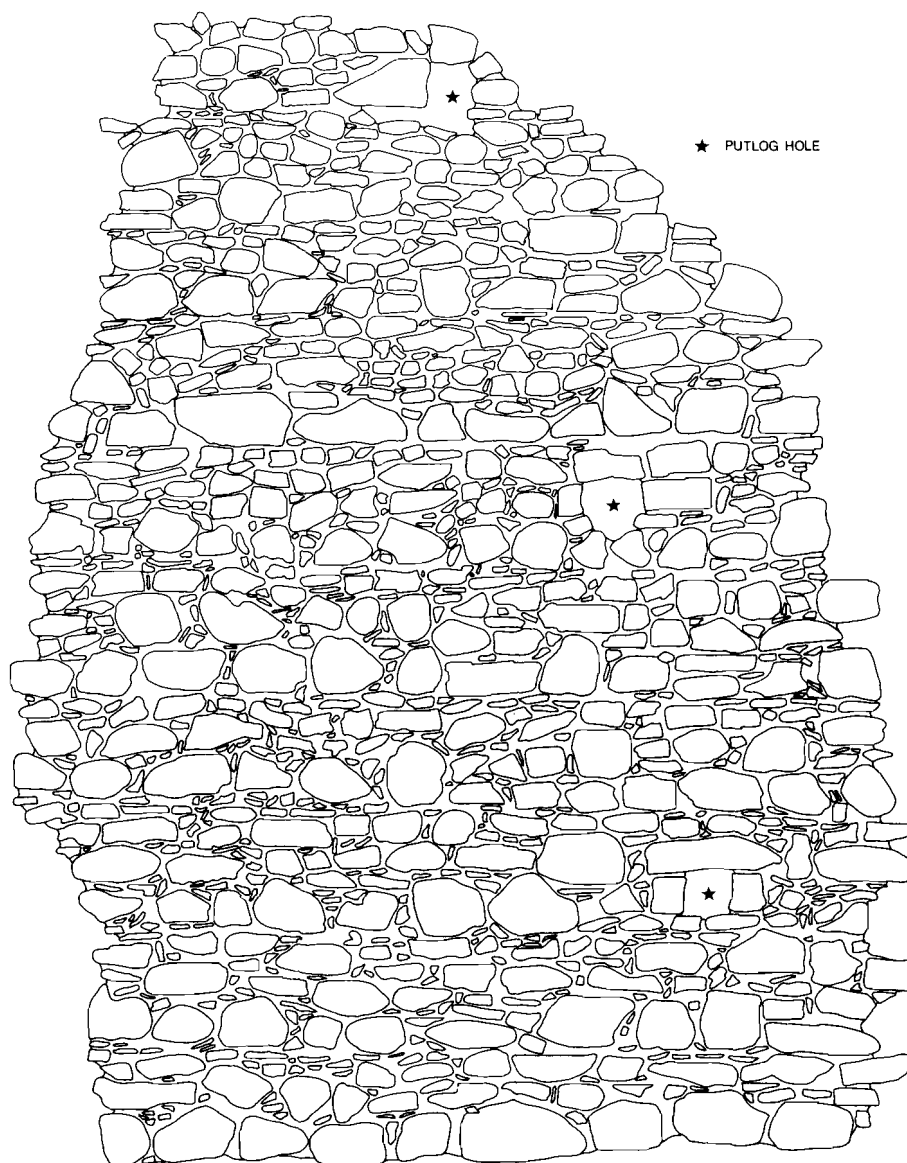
Hope all Saints: Elevation drawing of the fabric of the exterior of the West Wall of Nave, southern end, 1988.
